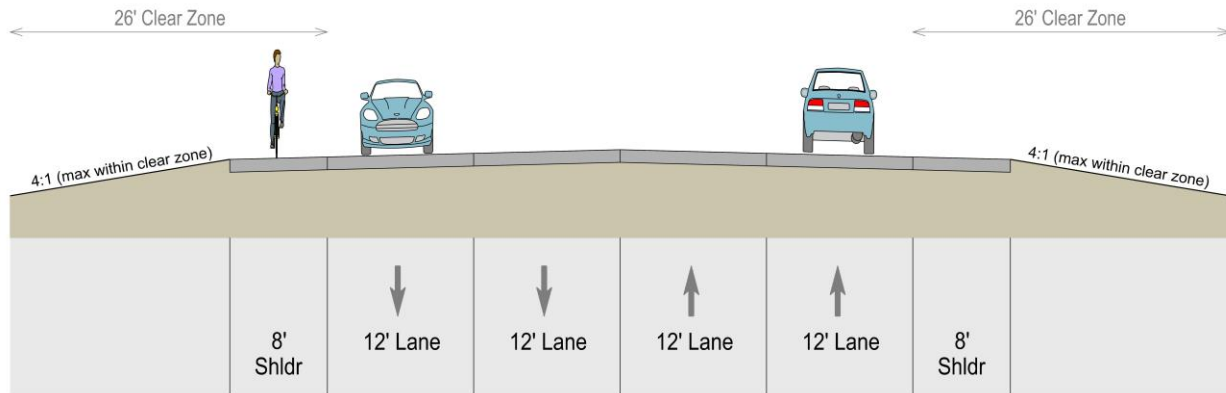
FUTURE TYPICAL ROADWAY CROSS-SECTION, CORRAL DRIVE TO WILDWOOD DRIVE
